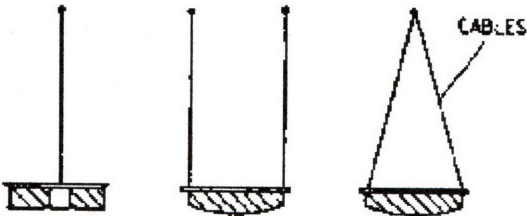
Single plane, double plane and A-frame arrangement of the cables in a cable-stayed bridge
